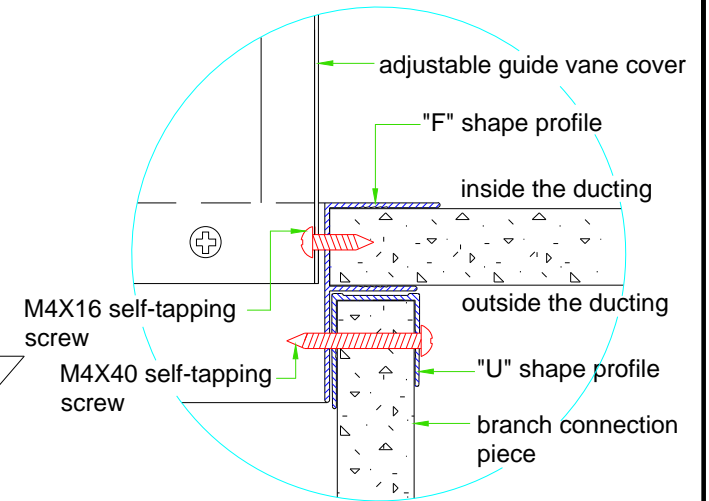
, Install adjustable guide vane. (refer to the installation sketch map of " adjustable guide vane cover ")
